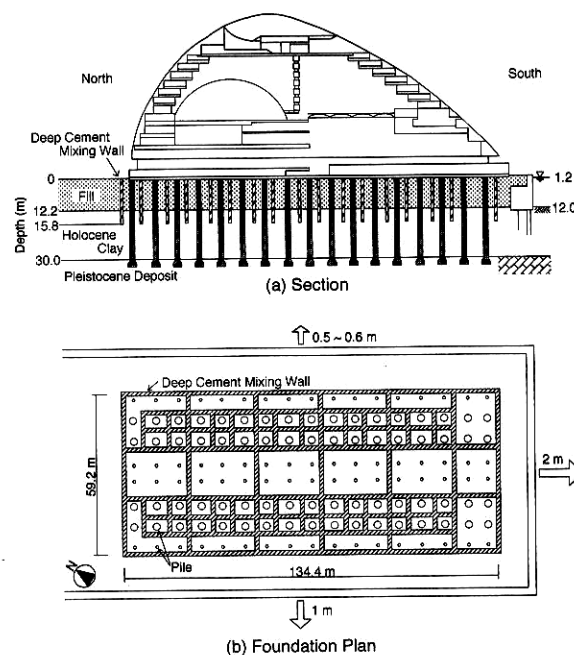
Section and plan of a building founded on piles surrounded by deep cement mixing walls (after Tokimatsu et al., 1996).
